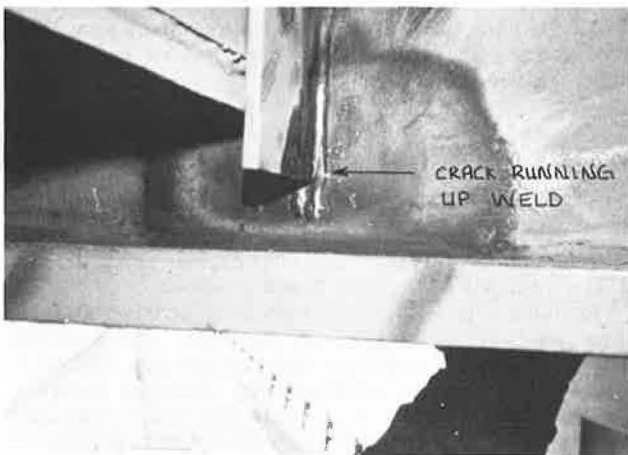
Crack in web-to-flange weld below stiffener.
